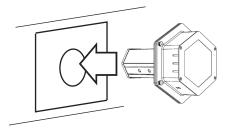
Cut opening in duct, attach mounting plate, and install device
